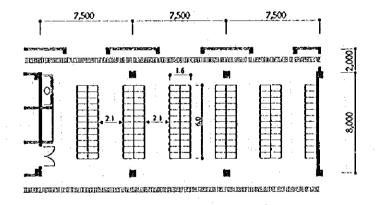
Plan of Fish Handling & Ice Storage Building
